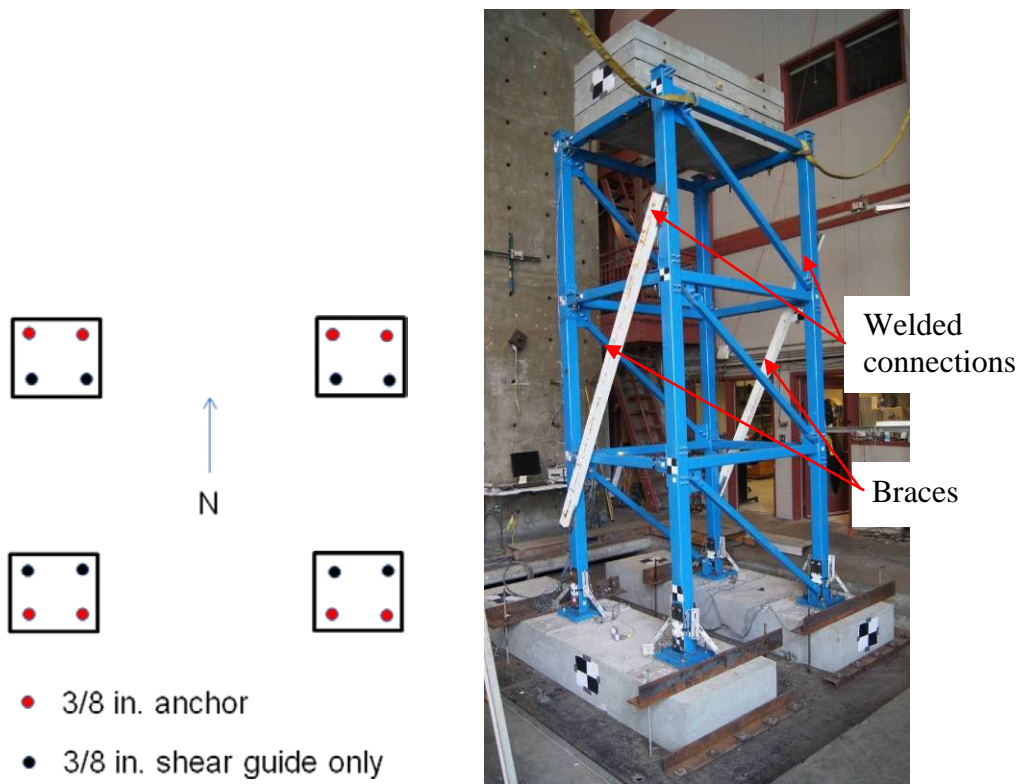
Anchor layout (left) and brace locations, Configuration 5 (TBD BF)
